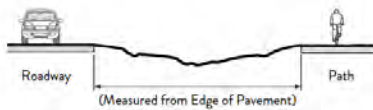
Sidepath Separation from Roadway, Rural Section
